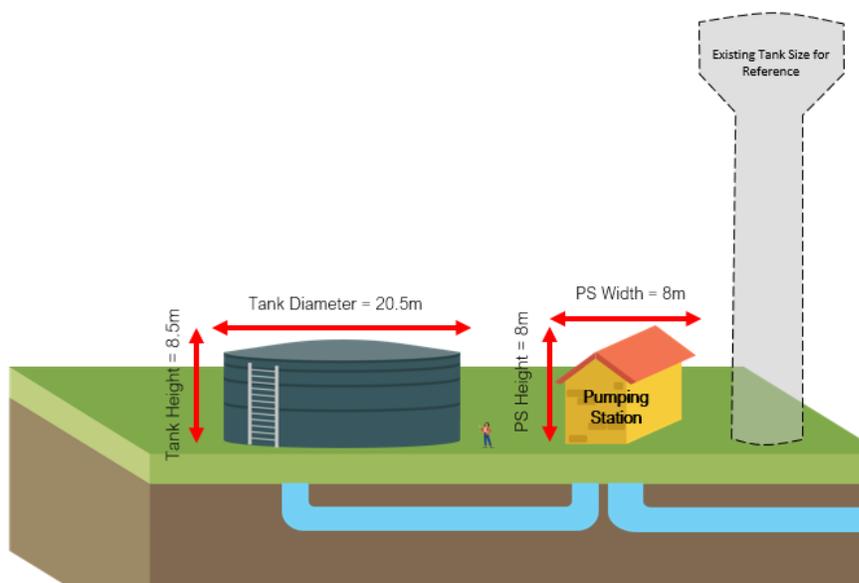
Alternative 8: Above Ground Reservoir to Replace Existing Elevated Tank
